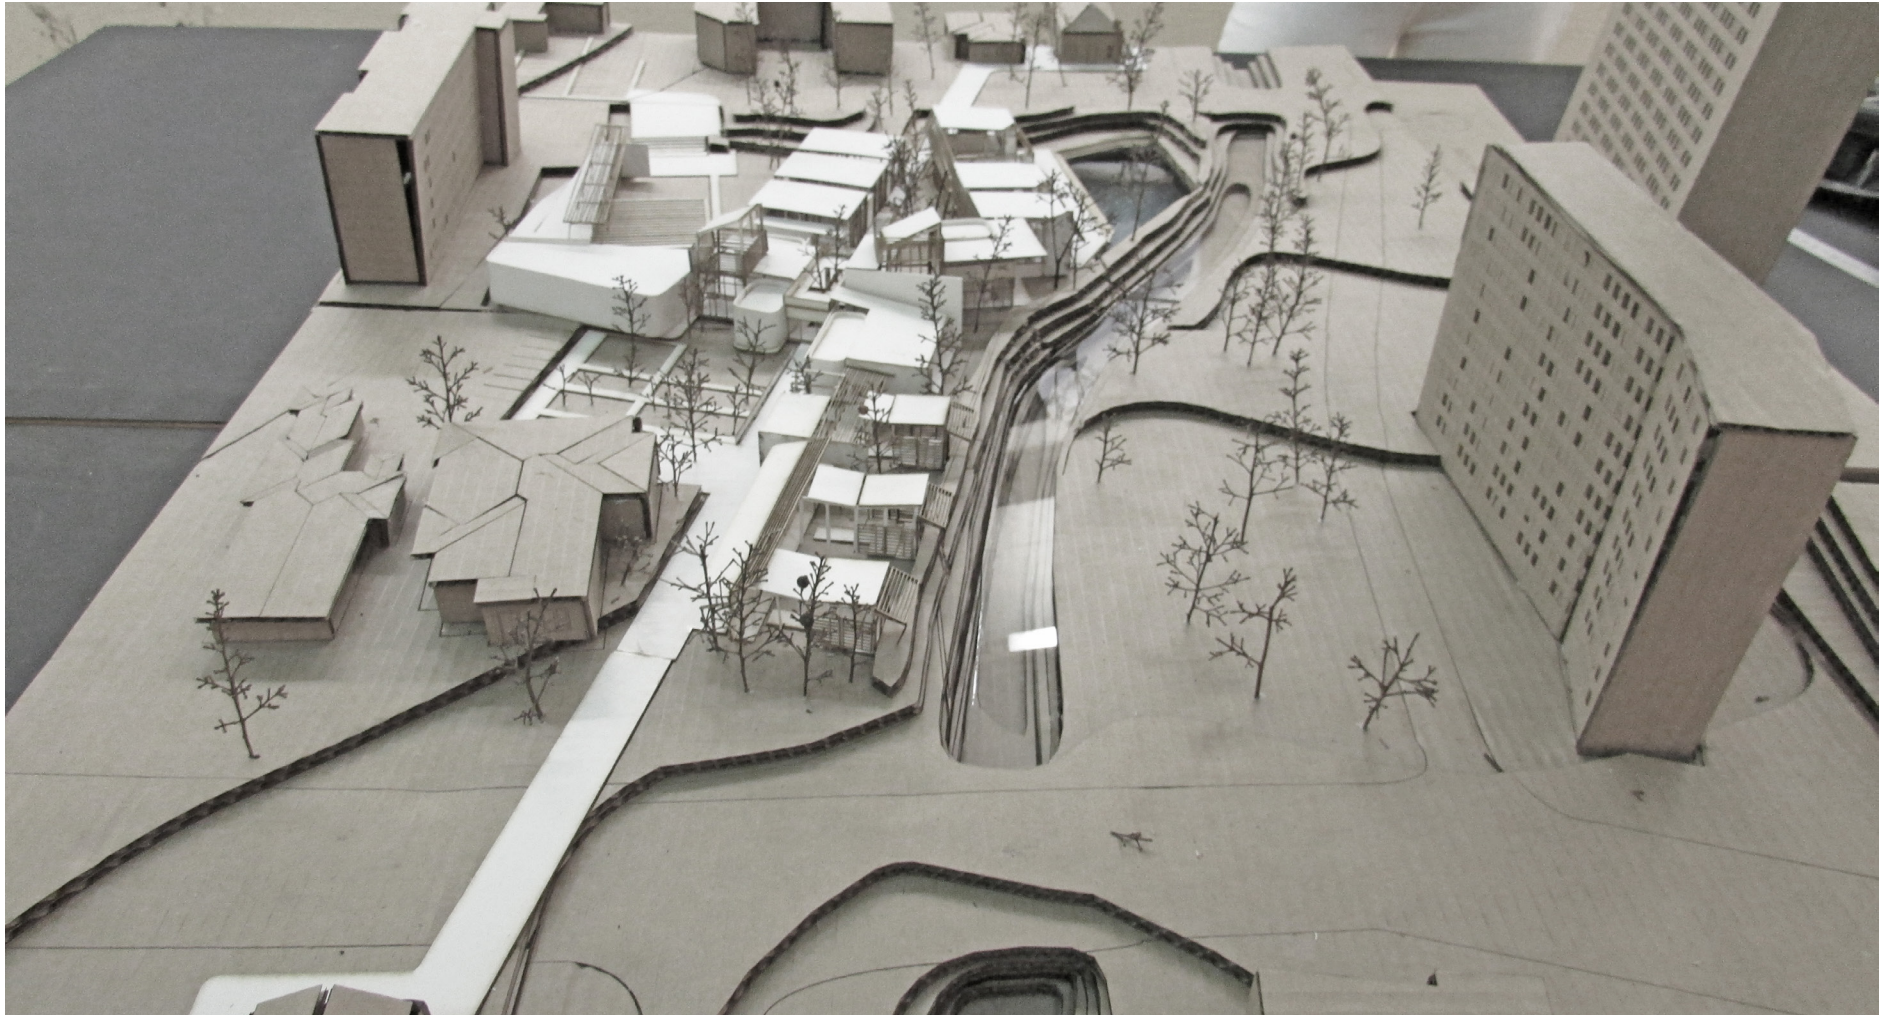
Final Model, overlooking entire site towards the East (Author, 2016)
